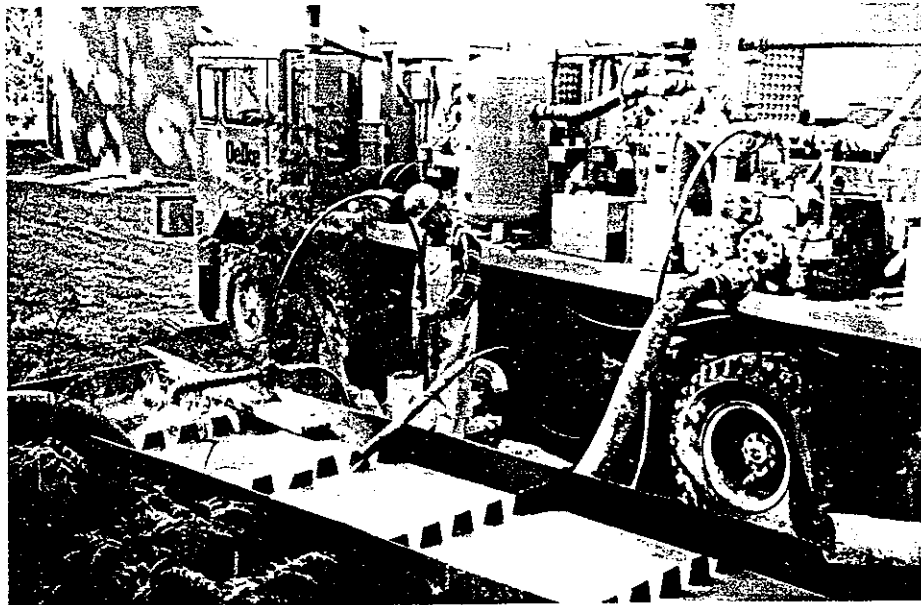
A portable mud pit can be transported from site to site. (Oelke Drilling Company)
